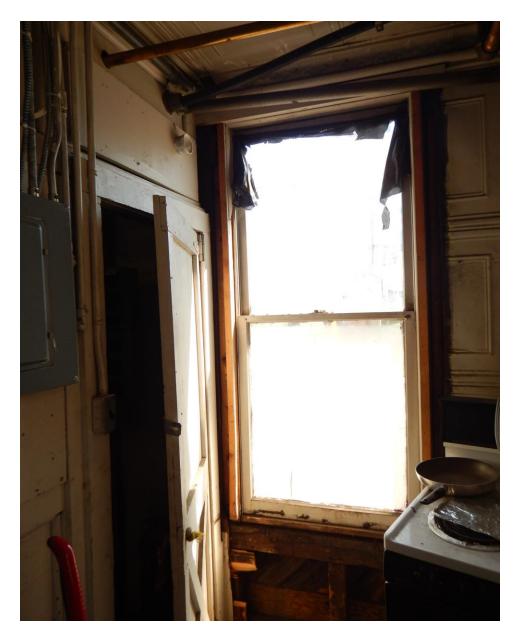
FIRST FLOOR MECHANICAL ROOM FACING EAST
